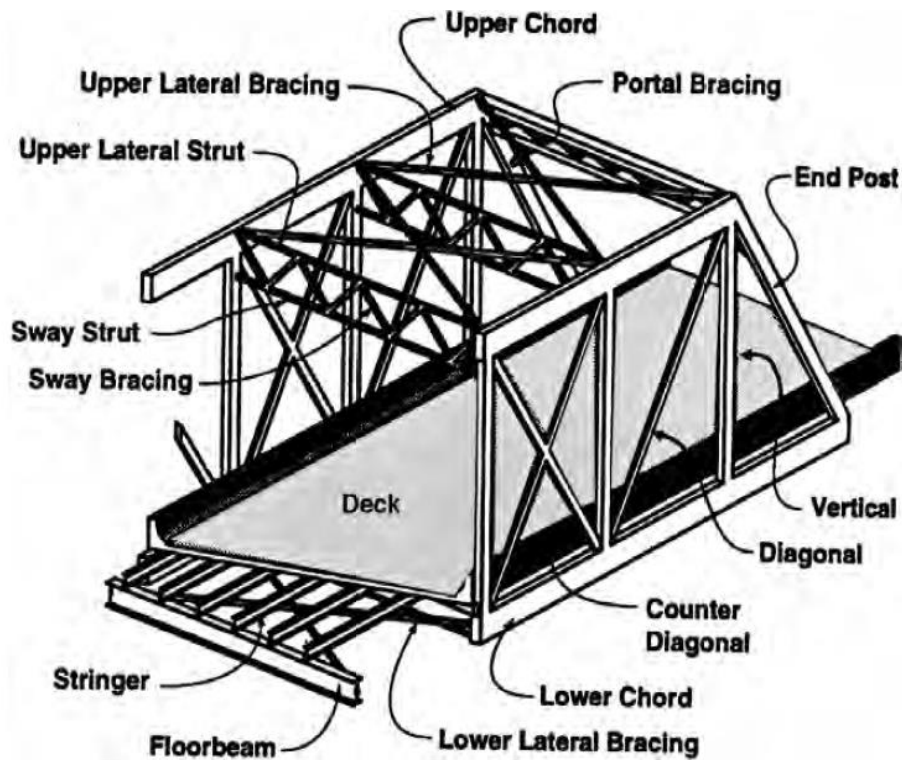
Typical Truss members (Hartel et al., 1990)
